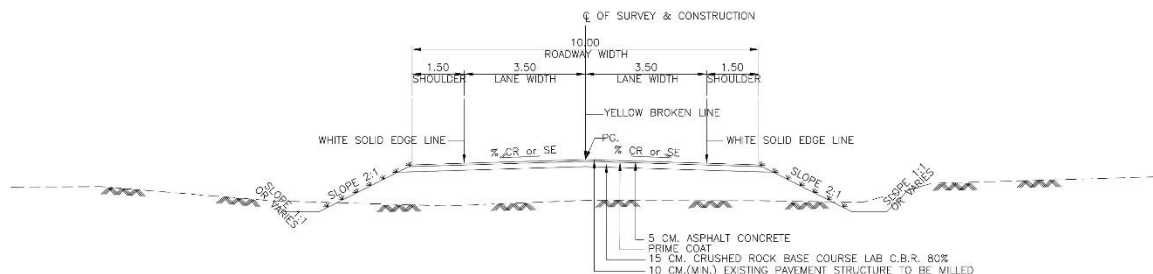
Alt.1 Asphalt Concrete Surface: Both Carriageway and Shoulder
